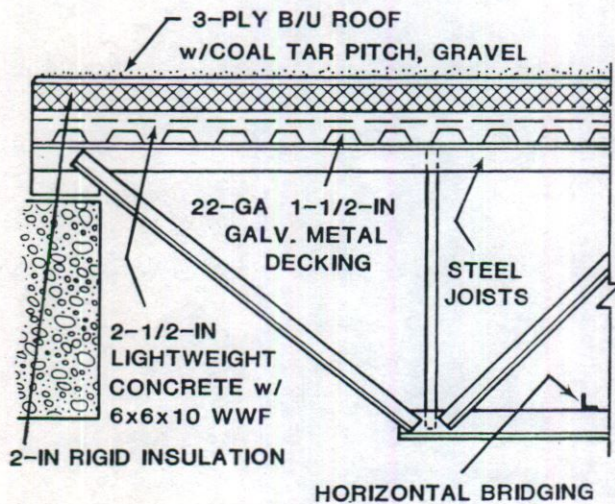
Type 3—Metal Roof Deck with Lightweight Concrete
